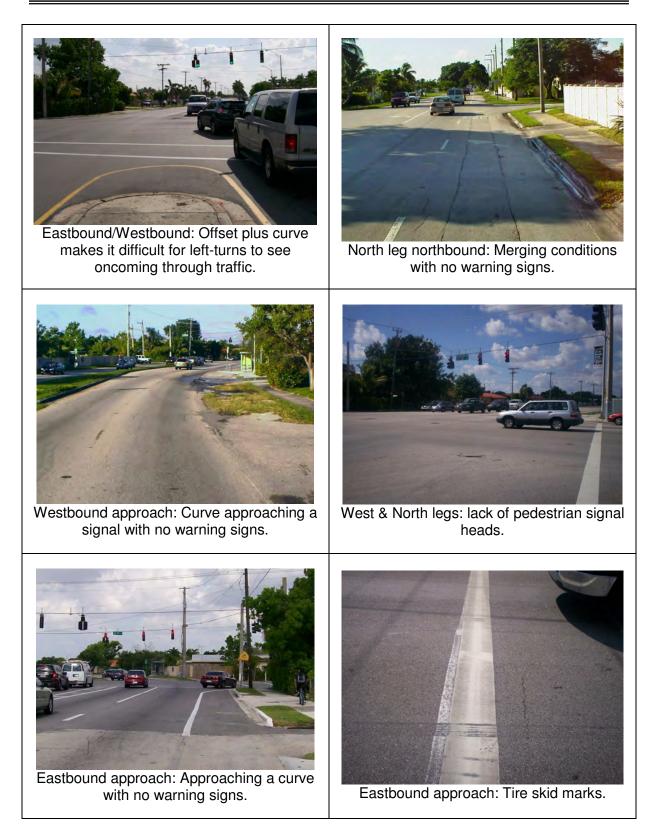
Field Review – SW 122 Avenue and SW 26 Street
